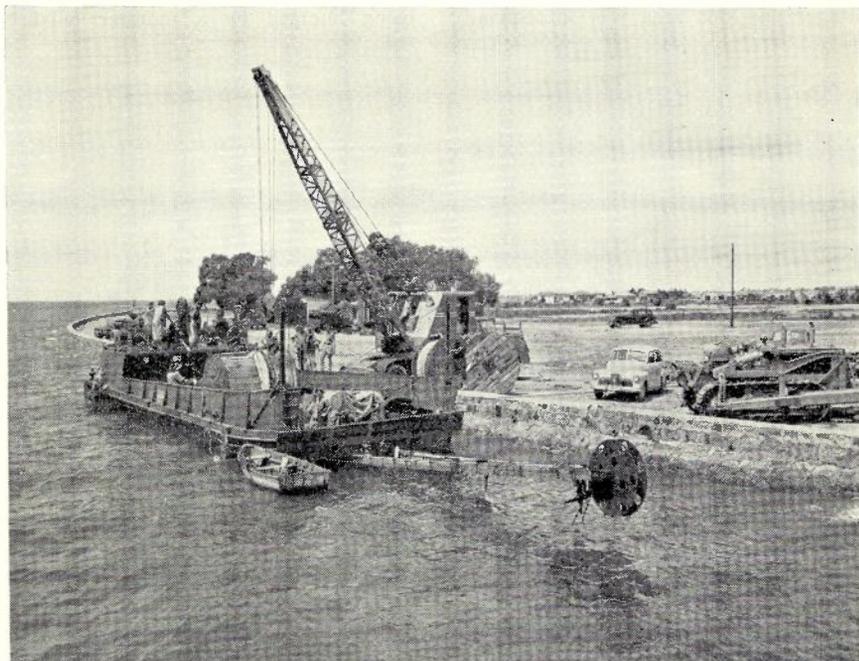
Loading dock at high tide. Barge being loaded with cable drums. Note use of bulldozer winch.
